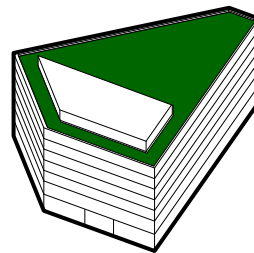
Opportunities for a public roof terrace on the hotel roof, overlooked by a rooftop pavilion
